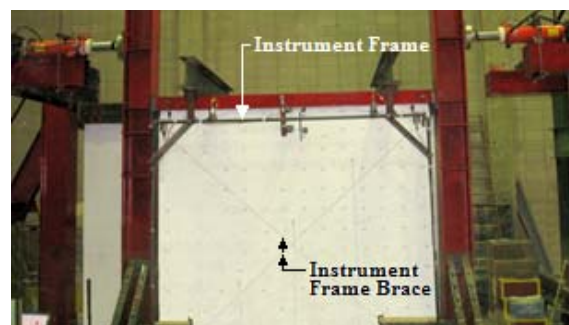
Typical Test Wall, Test Frame, Load Actuators, and Instrumentation
